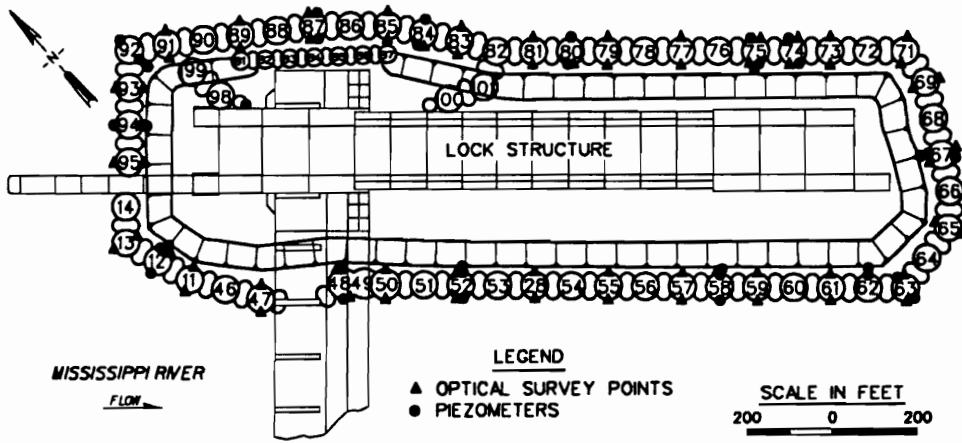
Plan view of the second-stage Lock and Dam No. 26(R) cofferdam.
